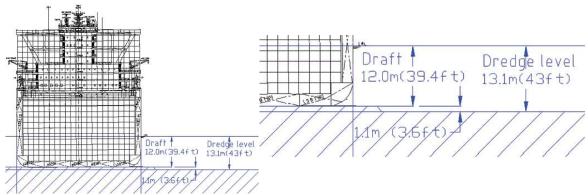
Aft ship draft and additional dredging depth (section view left, detailed section view right)
